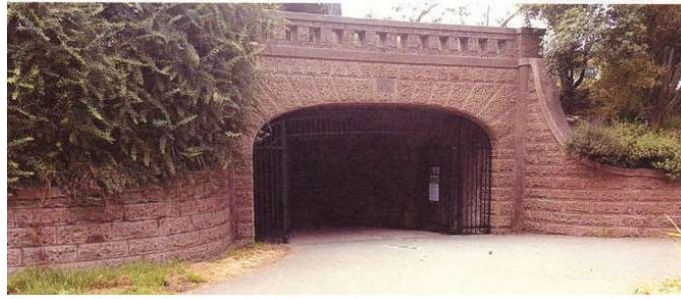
Constructed in 1889, the first reinforced concrete bridge in America (17)
